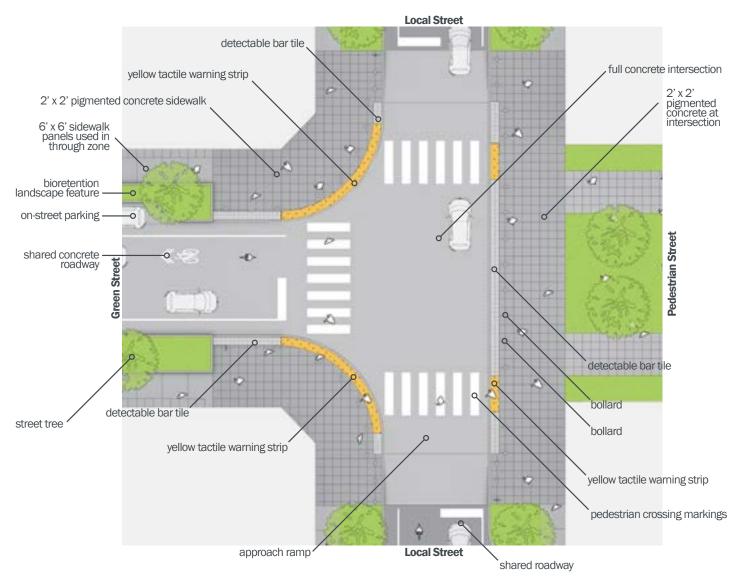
Example intersection of a Pedestrian Street with a Green and Local Street.
